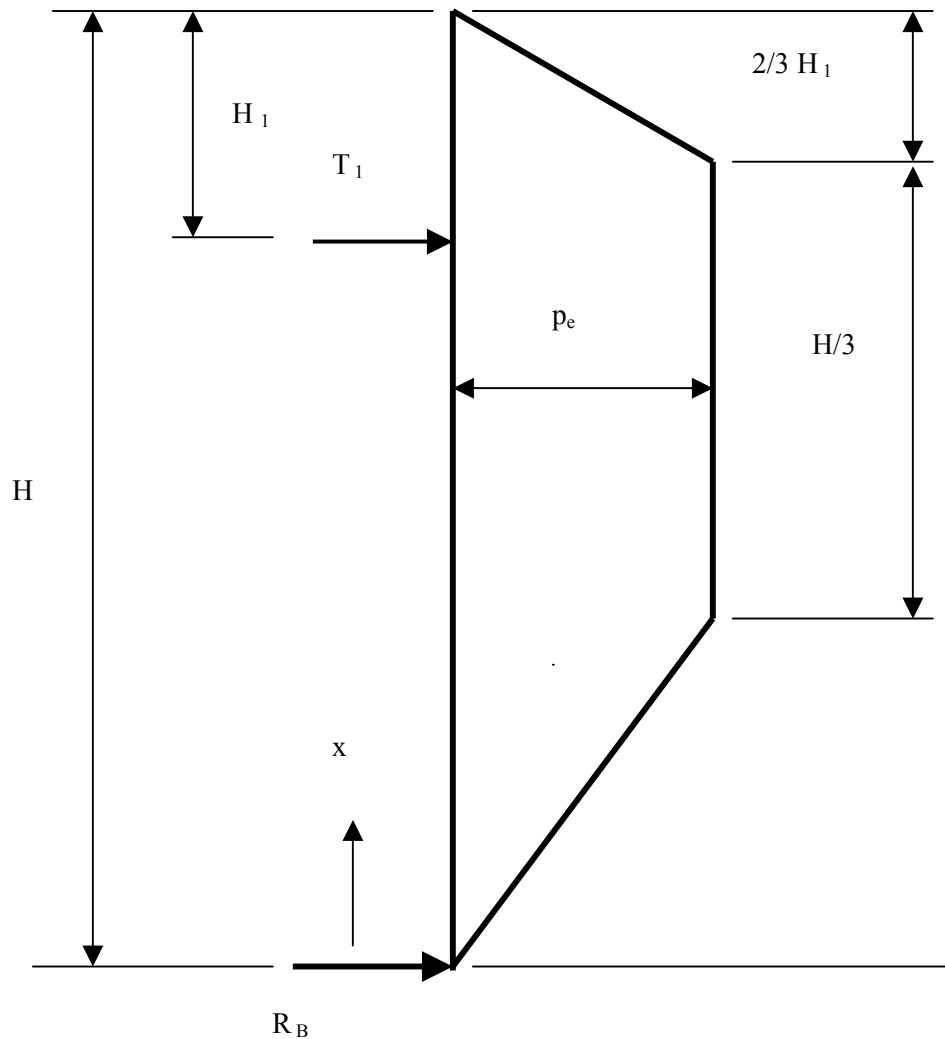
Recommended apparent earth pressure diagram for wall supported by one row of anchors—for granular soils (Figure 28, FHWA-RD-97-130)
